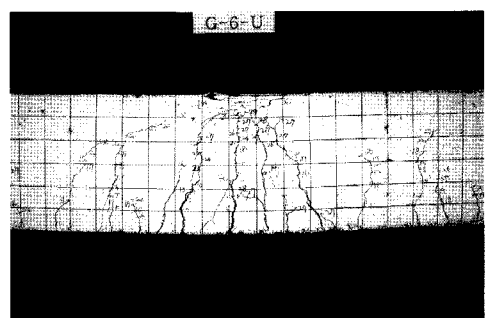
Tension Cracks and Compression Cracks of Concrete (U Beam)
